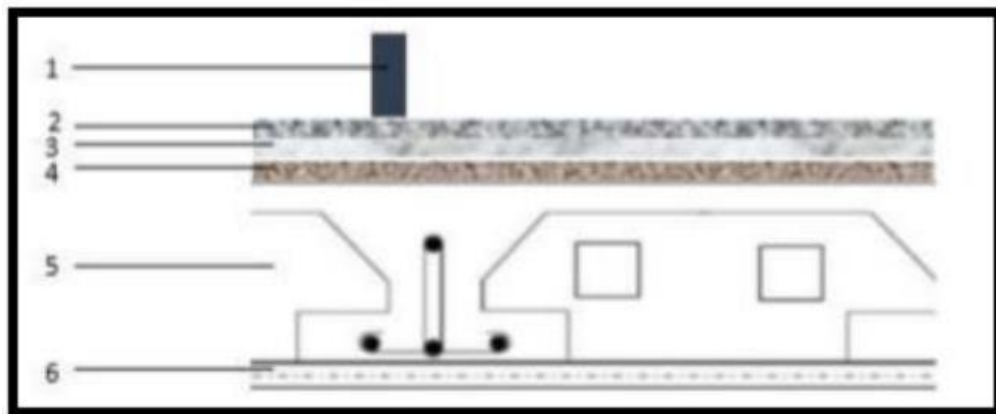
Detail of the floor slab (DTR B.C.2.2)
